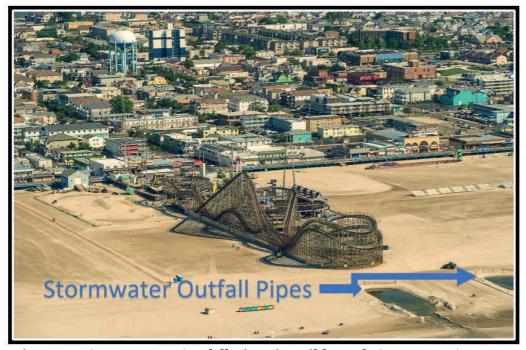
Stormwater Outfall Pipes in Wildwood, Cape May County
